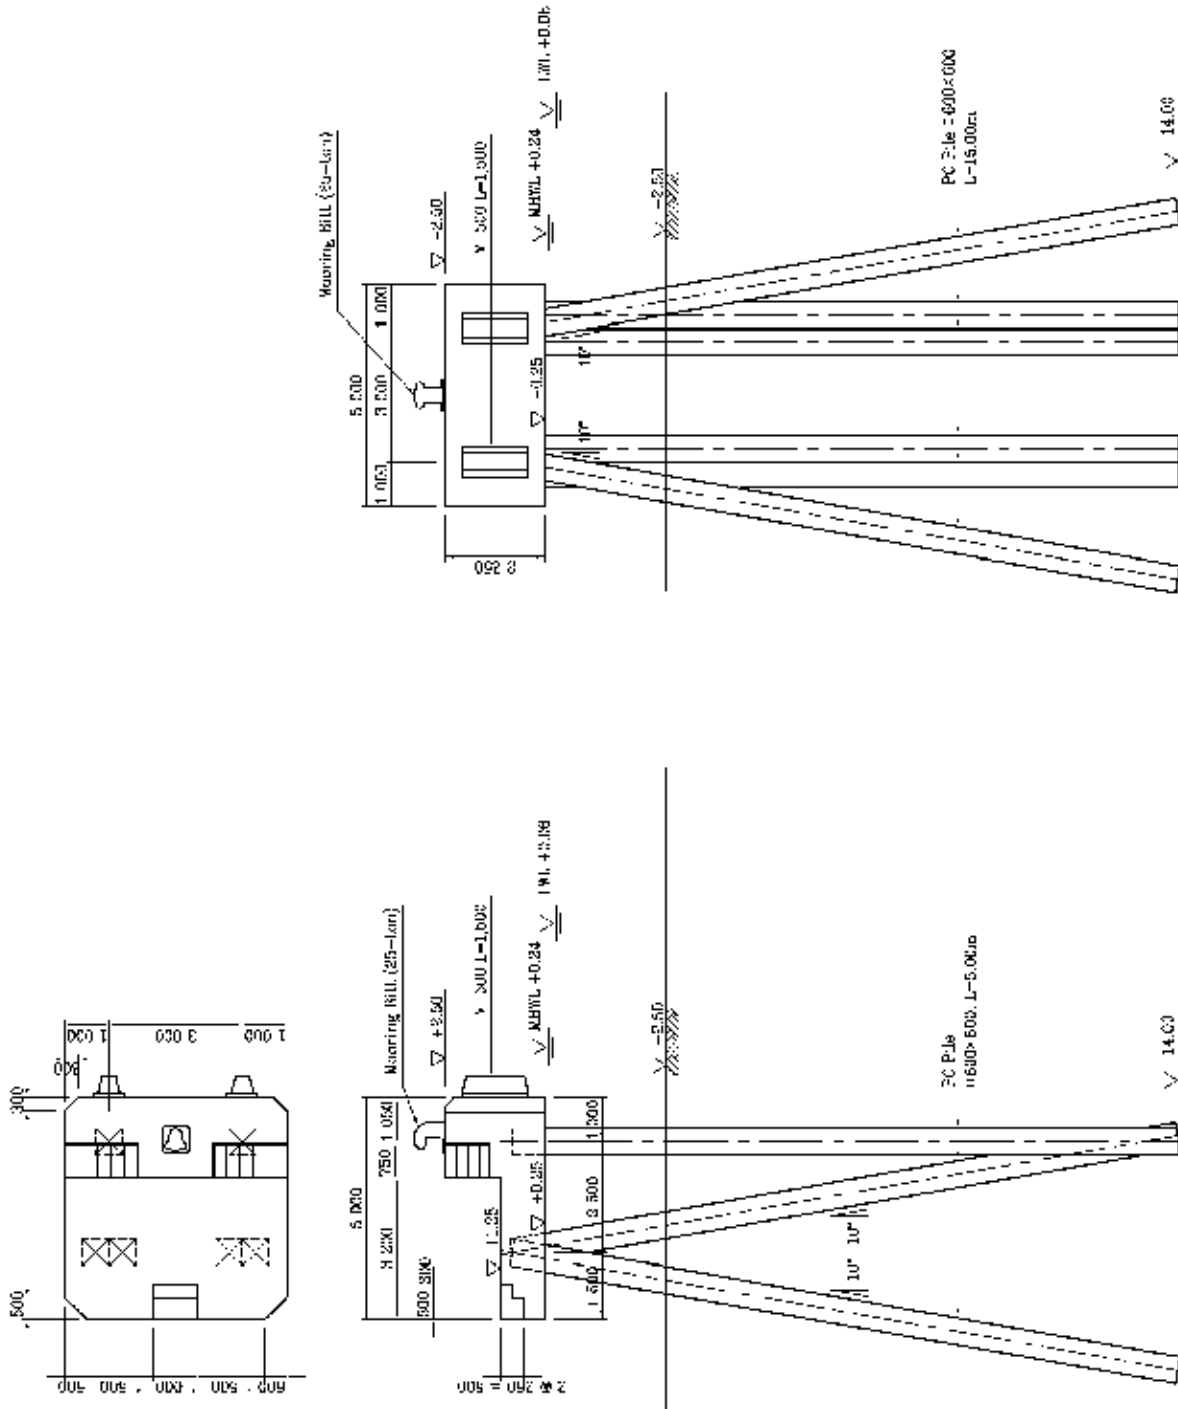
Typical Plan and Sections of Dolphin Mooring Structure
